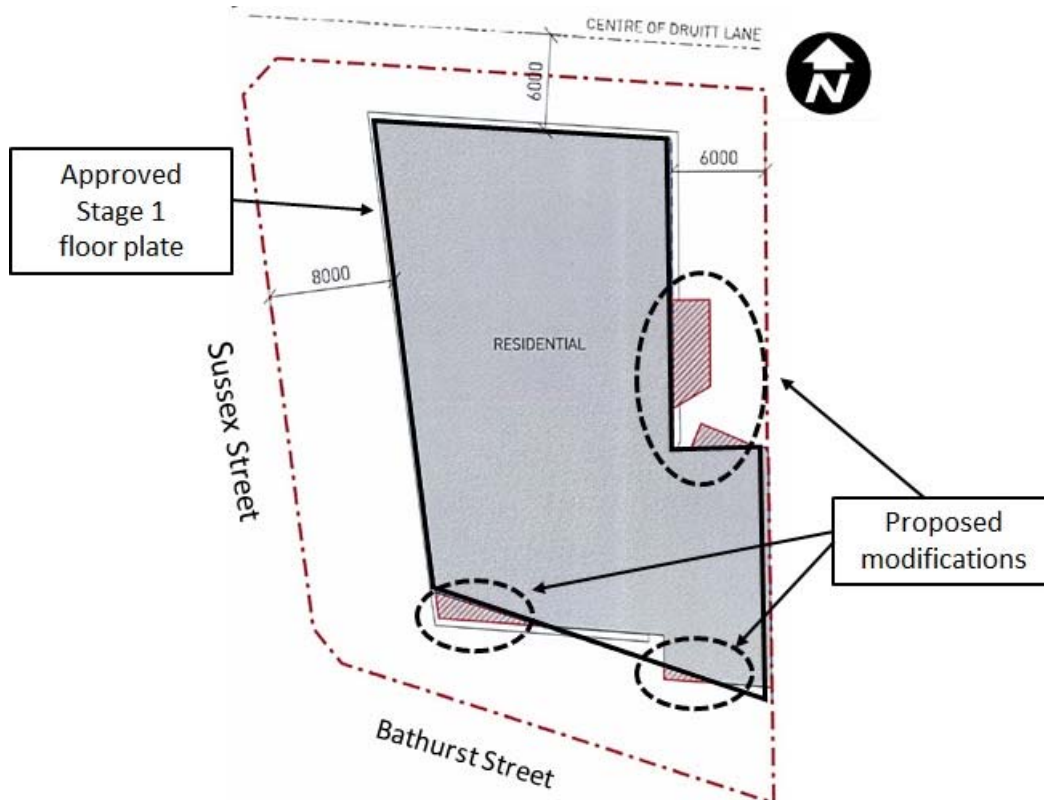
Proposed modifications to floor plates – levels 11 to 24.
